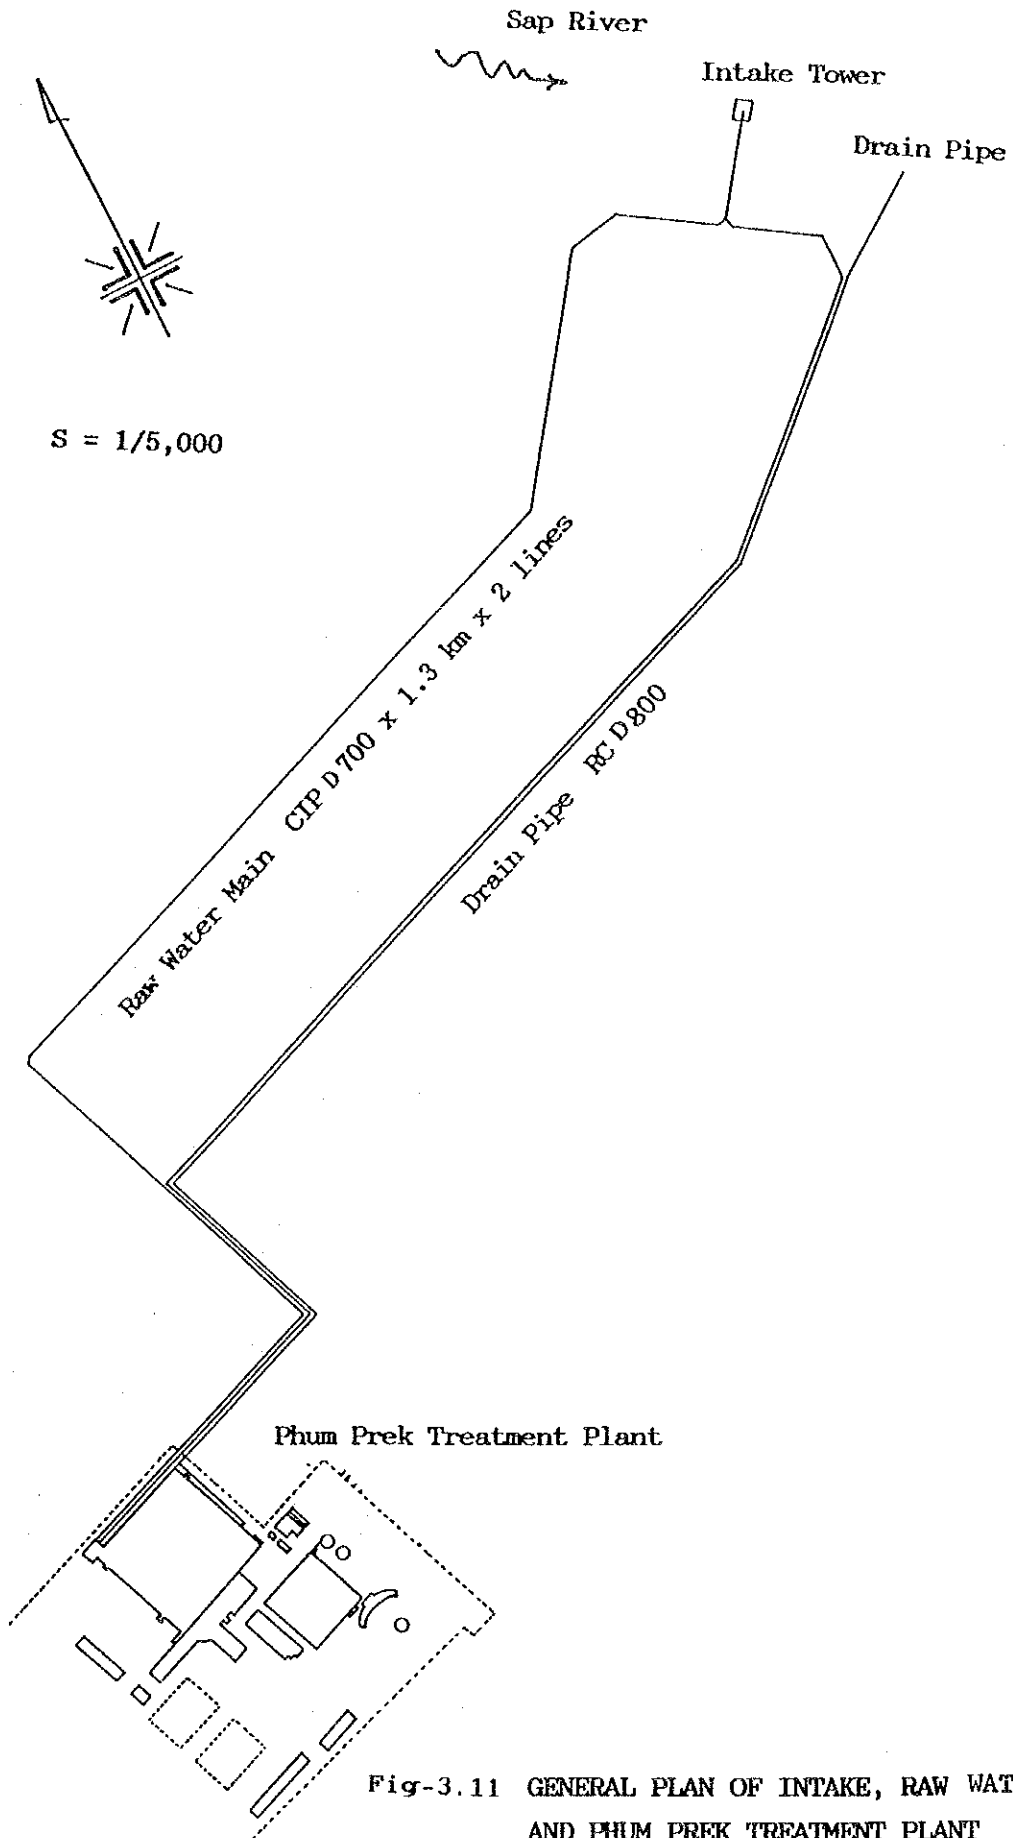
GENERAL PLAN OF INTAKE, RAW WATER MAIN AND PHUM PREK TREATMENT PLANT
